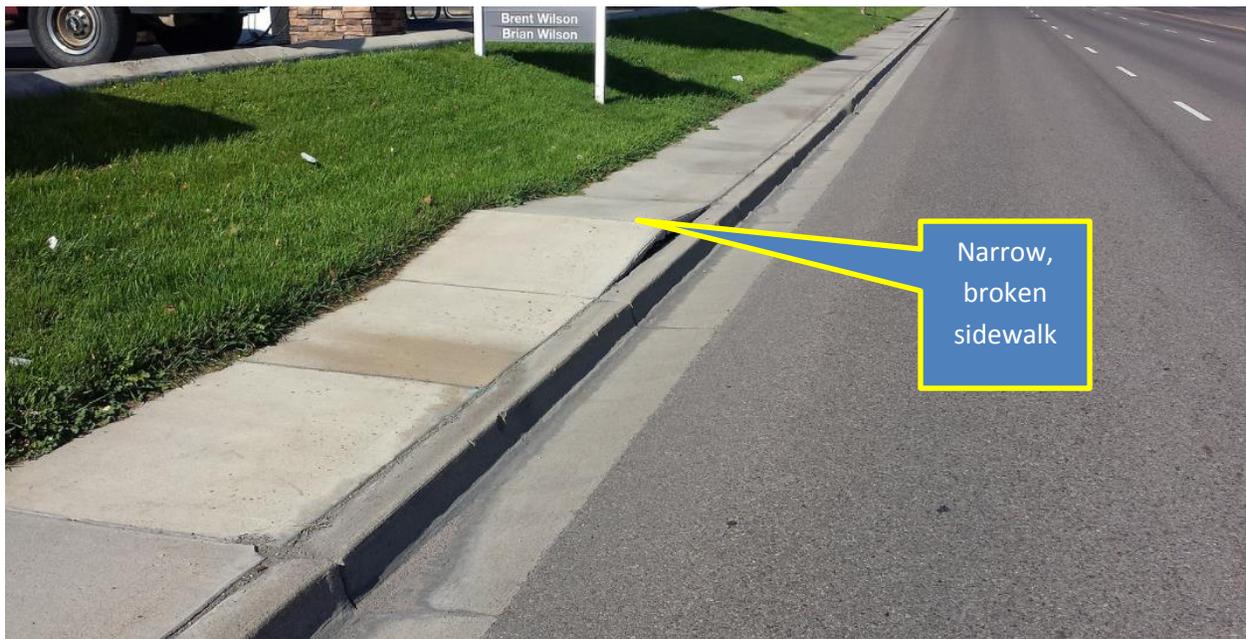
Sidewalk on North Side of Pocatello Creek Rd.
